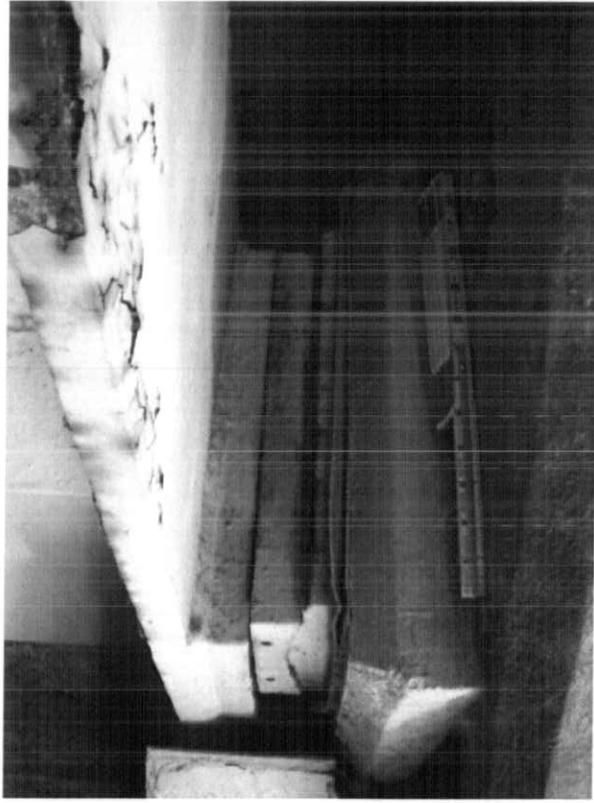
Girder 5 Expansion Bearing, South Abutment, looking south – 11/16-inch misalignment to the east of the sliding plate compared to the masonry plate (note: anchor bolt sheared off).
